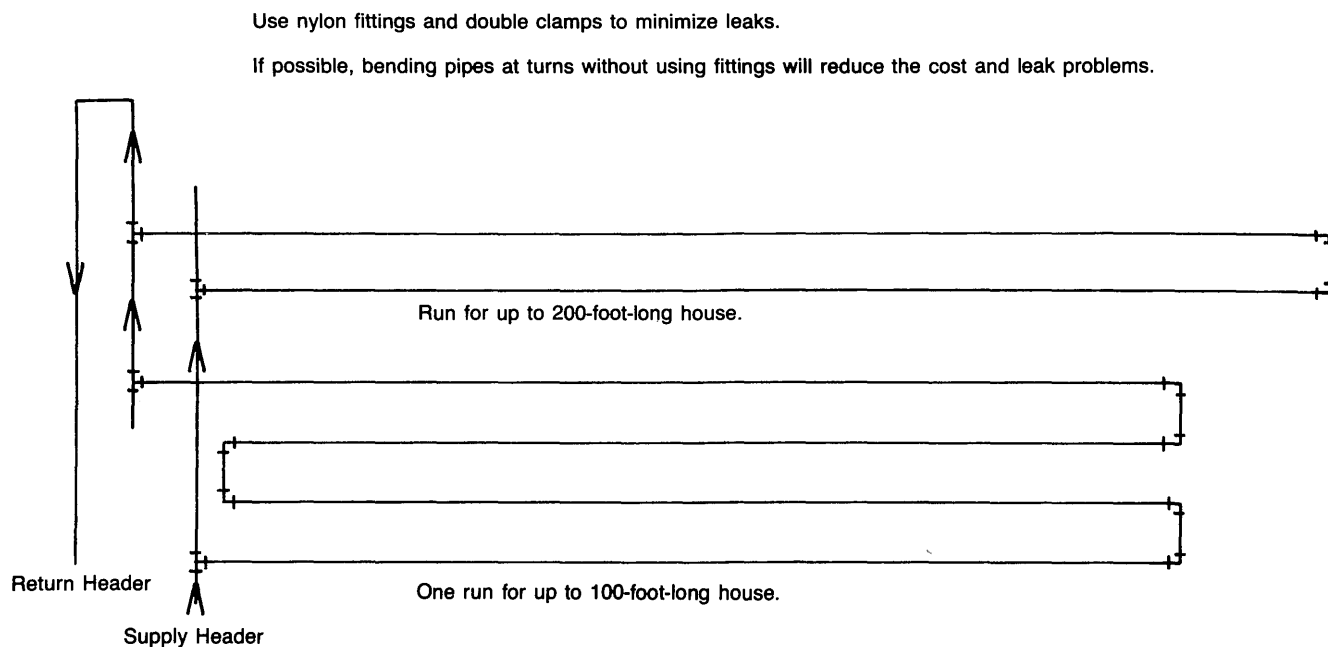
Pipe layout for soil heating showing runs for a short and a long greenhouse.
